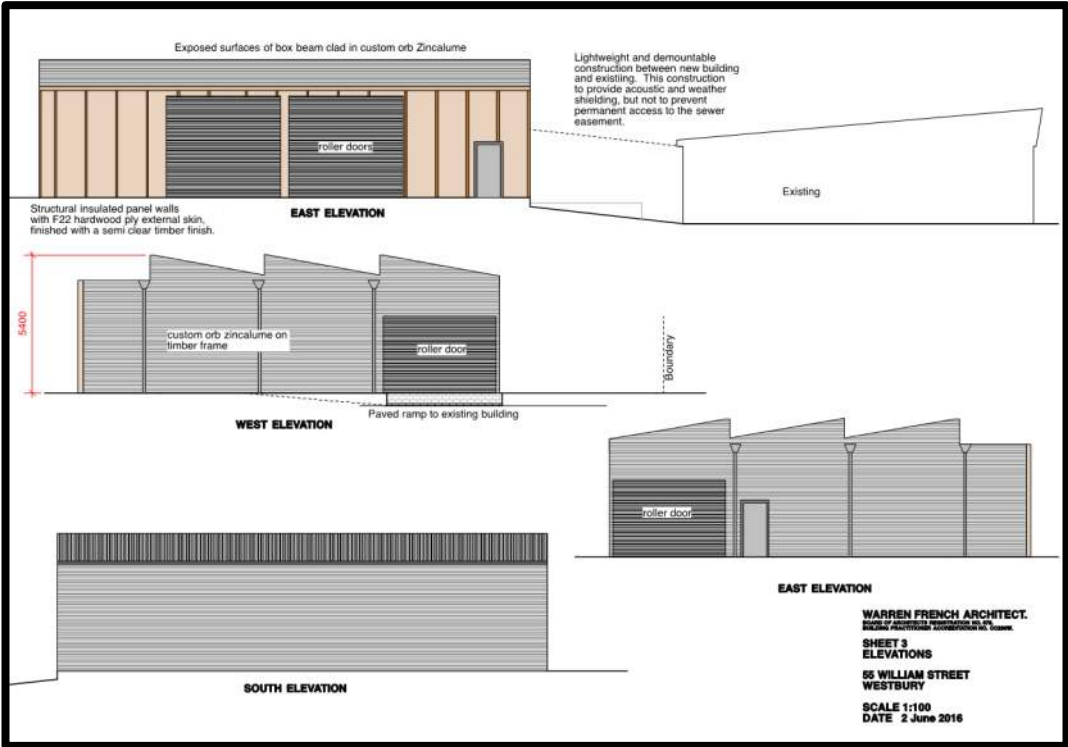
elevations (note; the timber clad elevation at the top of the diagram is the north elevation)
